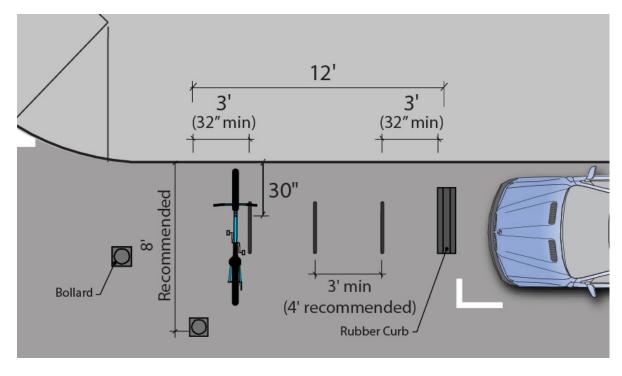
Sample Corral Layout with Perpendicular Racks Adjacent to Parallel Parking
